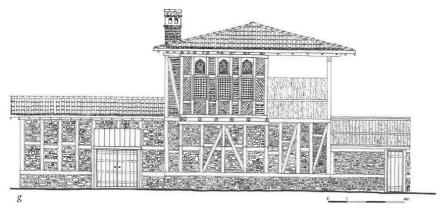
The construction system of the of Turkish House (Kuban, 2007).
